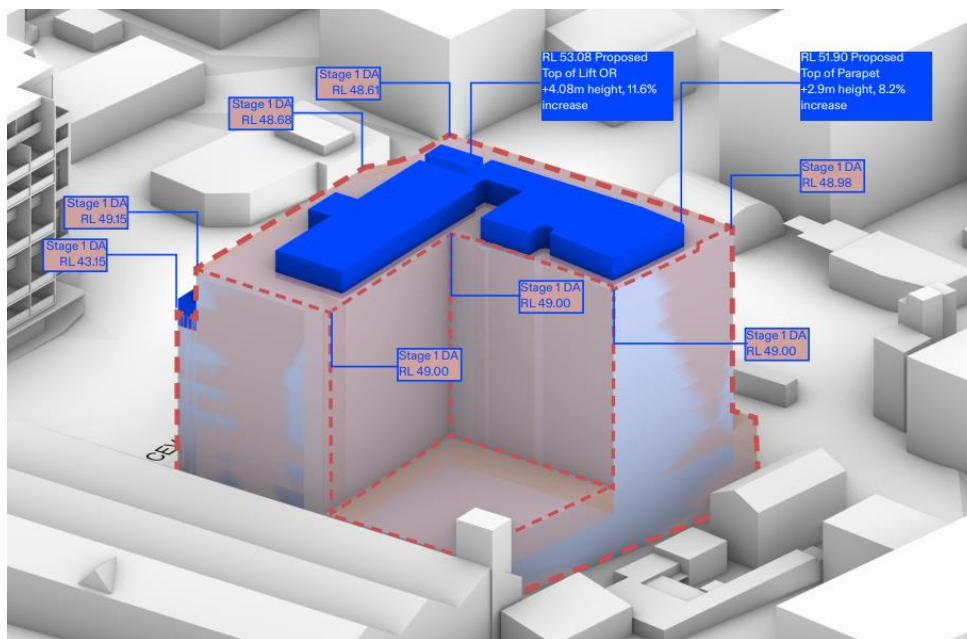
Proposed massing, with elements exceeding the Stage 1 Concept Envelope shown in blue
